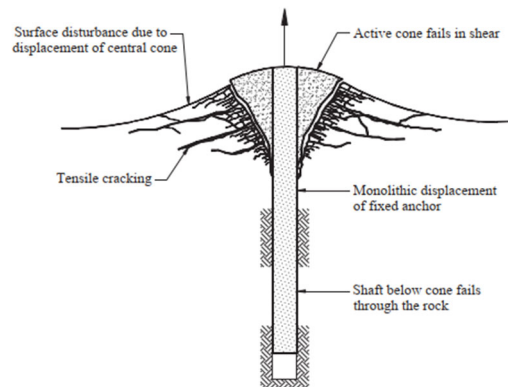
Failure by uplift of a fully grouted, straight-shafted, shallow, tensioned anchor in weak mudstone (Weerasinghe and Littlejohn, 1997).
